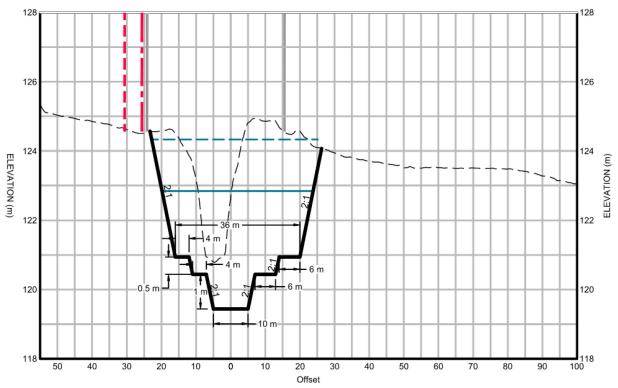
Preferred Design Creek Cross-section - 50 m upstream of Dixie Road
